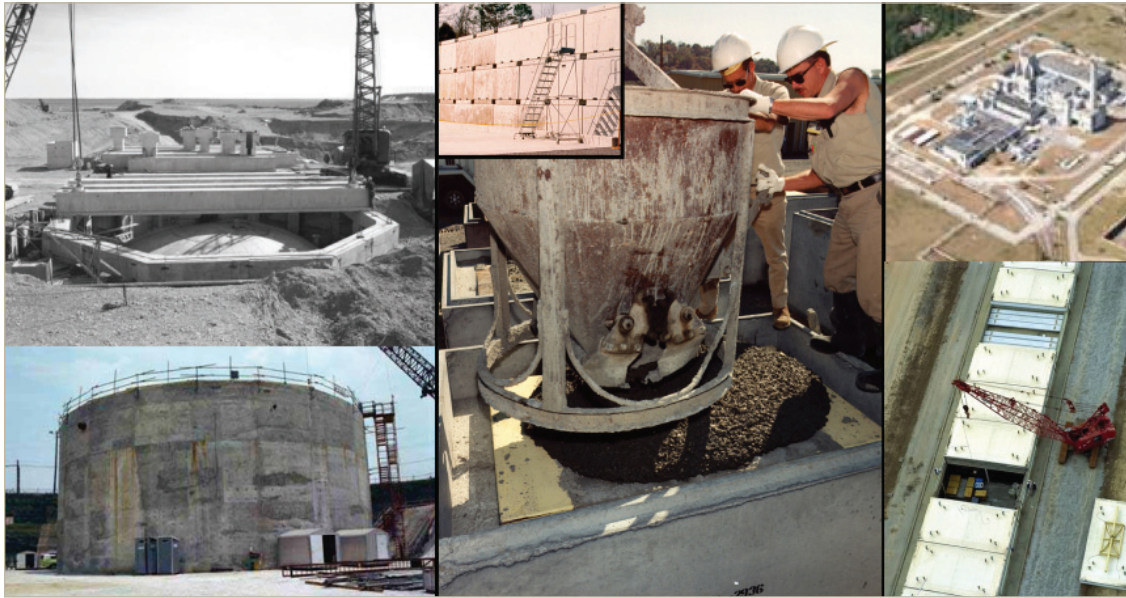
Examples of Cementitious Materials Considered in PAs (left to right: INL and SRS reinforced concrete HLW tank vaults, grouted containerized waste, reinforced concrete reactor facility, and concrete waste disposal vaults)
